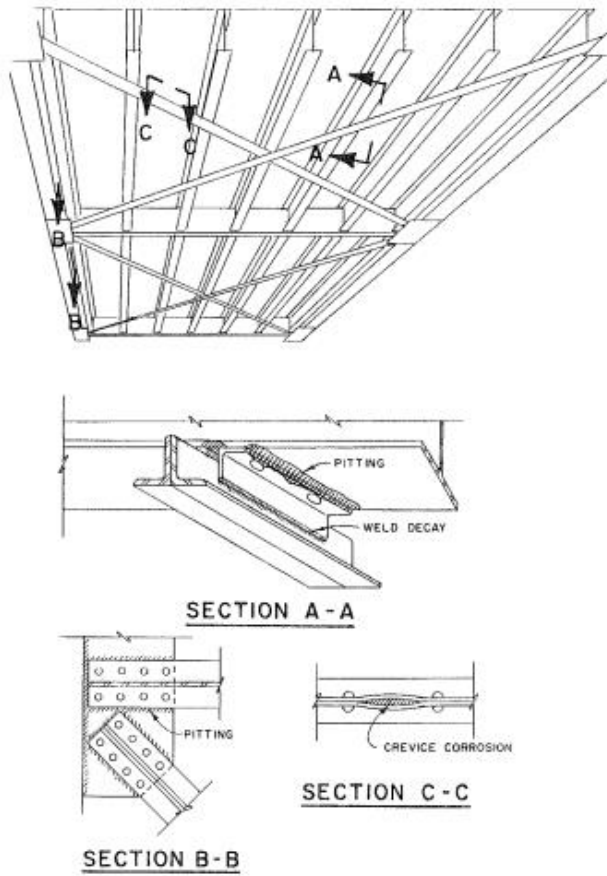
Deposit, crevice, pitting and weld decay attack the bottom beam [2]
